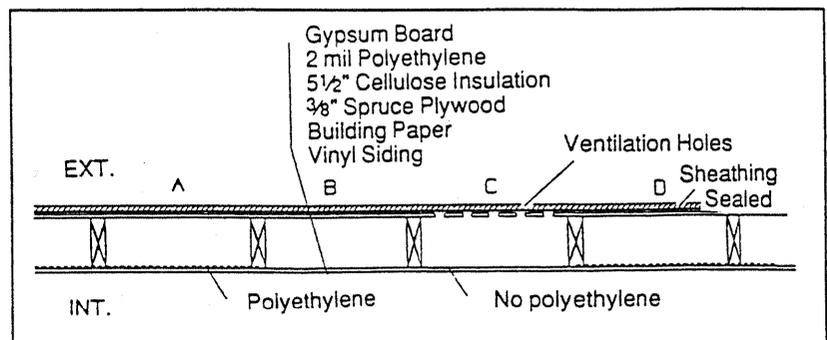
Wall section showing various test sections, with and without vapor retarder and different amounts of exterior ventilation.
